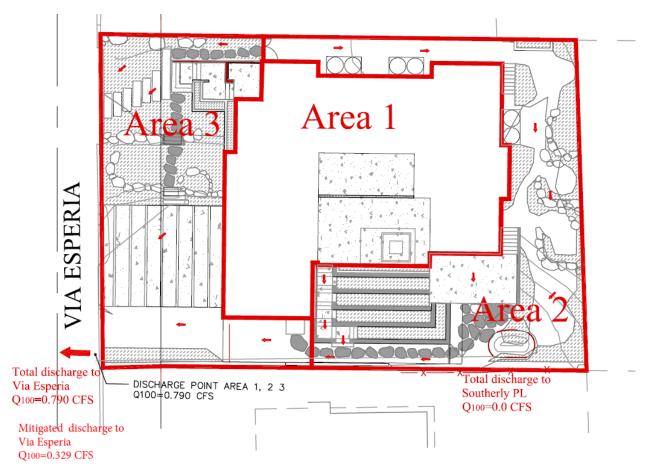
EXHIBIT C: PROPOSED CONDITION WITH NO DRAINAGE IMPROVEMENTS
